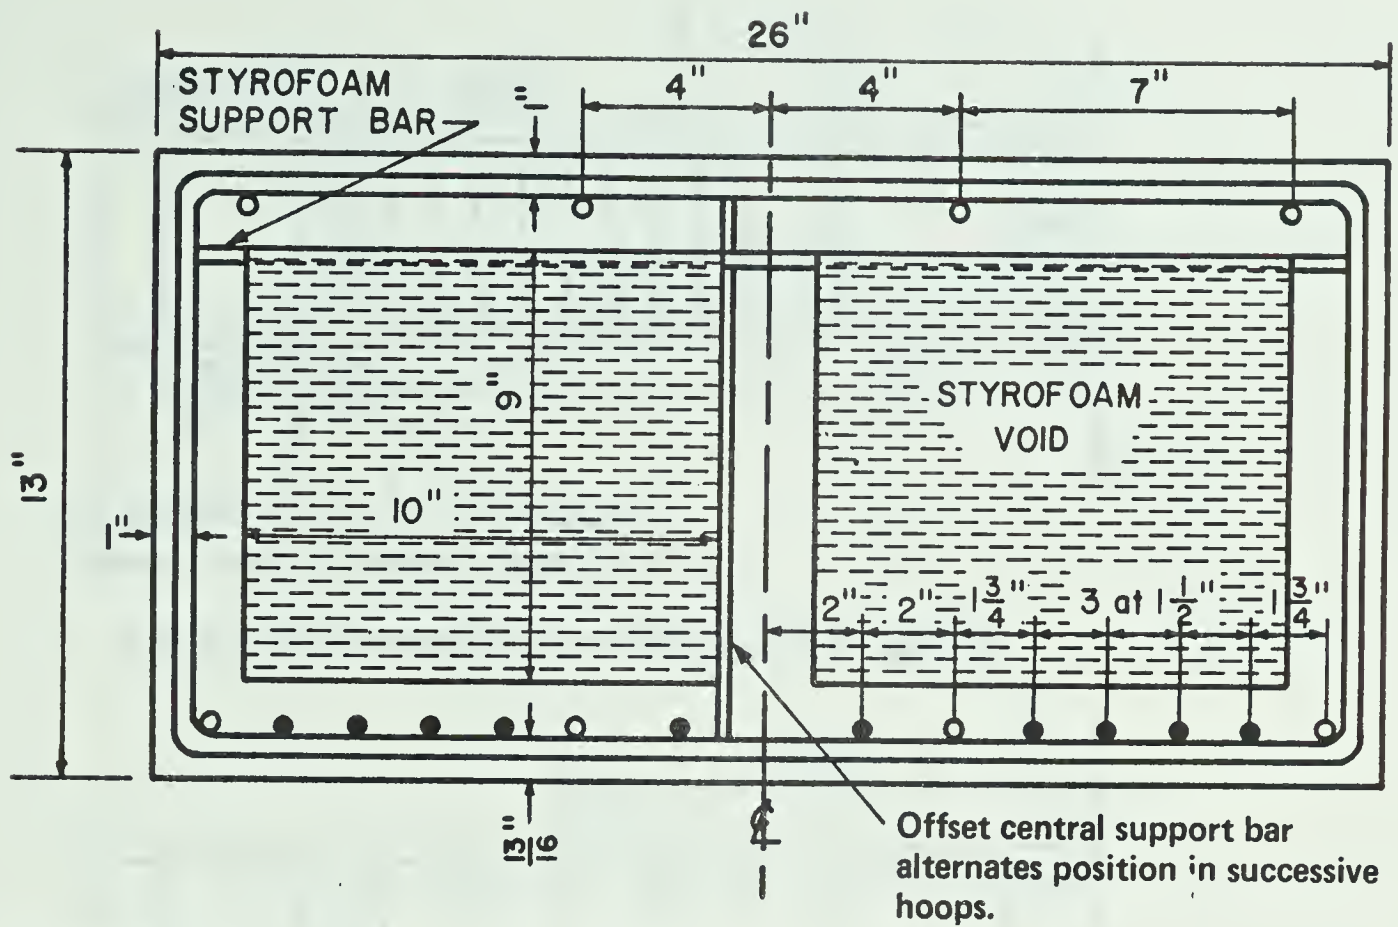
(A) RECTANGULAR BEAM CROSS-SECTION
